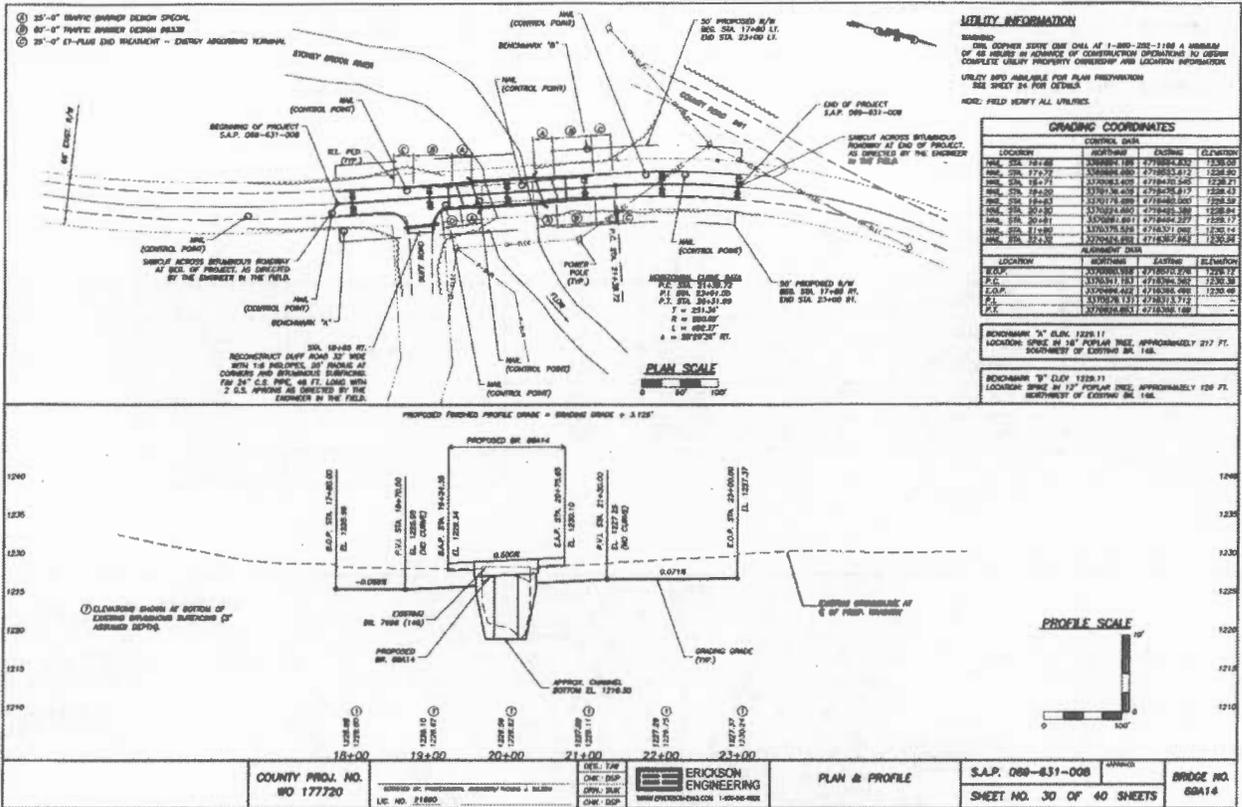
Bridge Replacement Plan & Profile, page 1.
